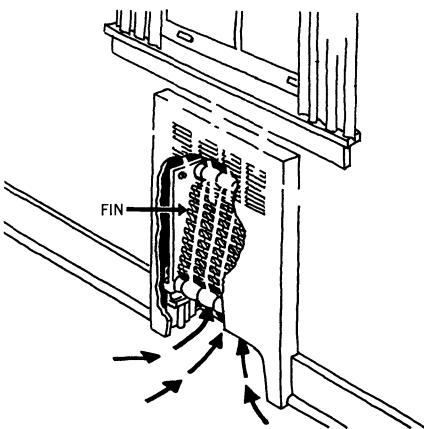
Convector for hot water or steam heating are installed against the wall or recessed in the wall as shown here.
